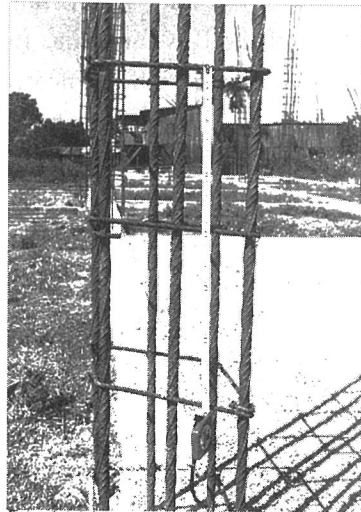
Reinforcement of the steel bars in the building under construction at Dharan Hospital, Dharan Bazaar, Nepal
